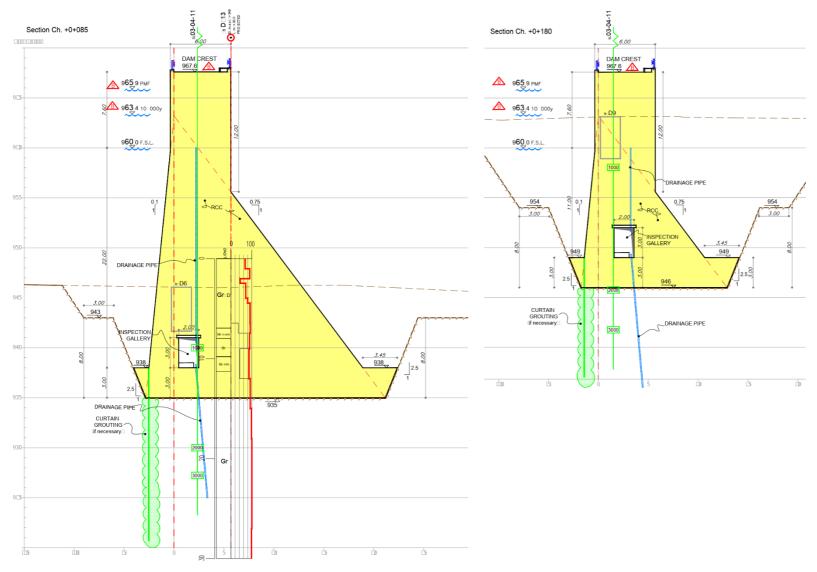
Right Dam - Cross-section of the Typical Non-overflow Section of the Dam (Studio Pietrangeli, 2019)
